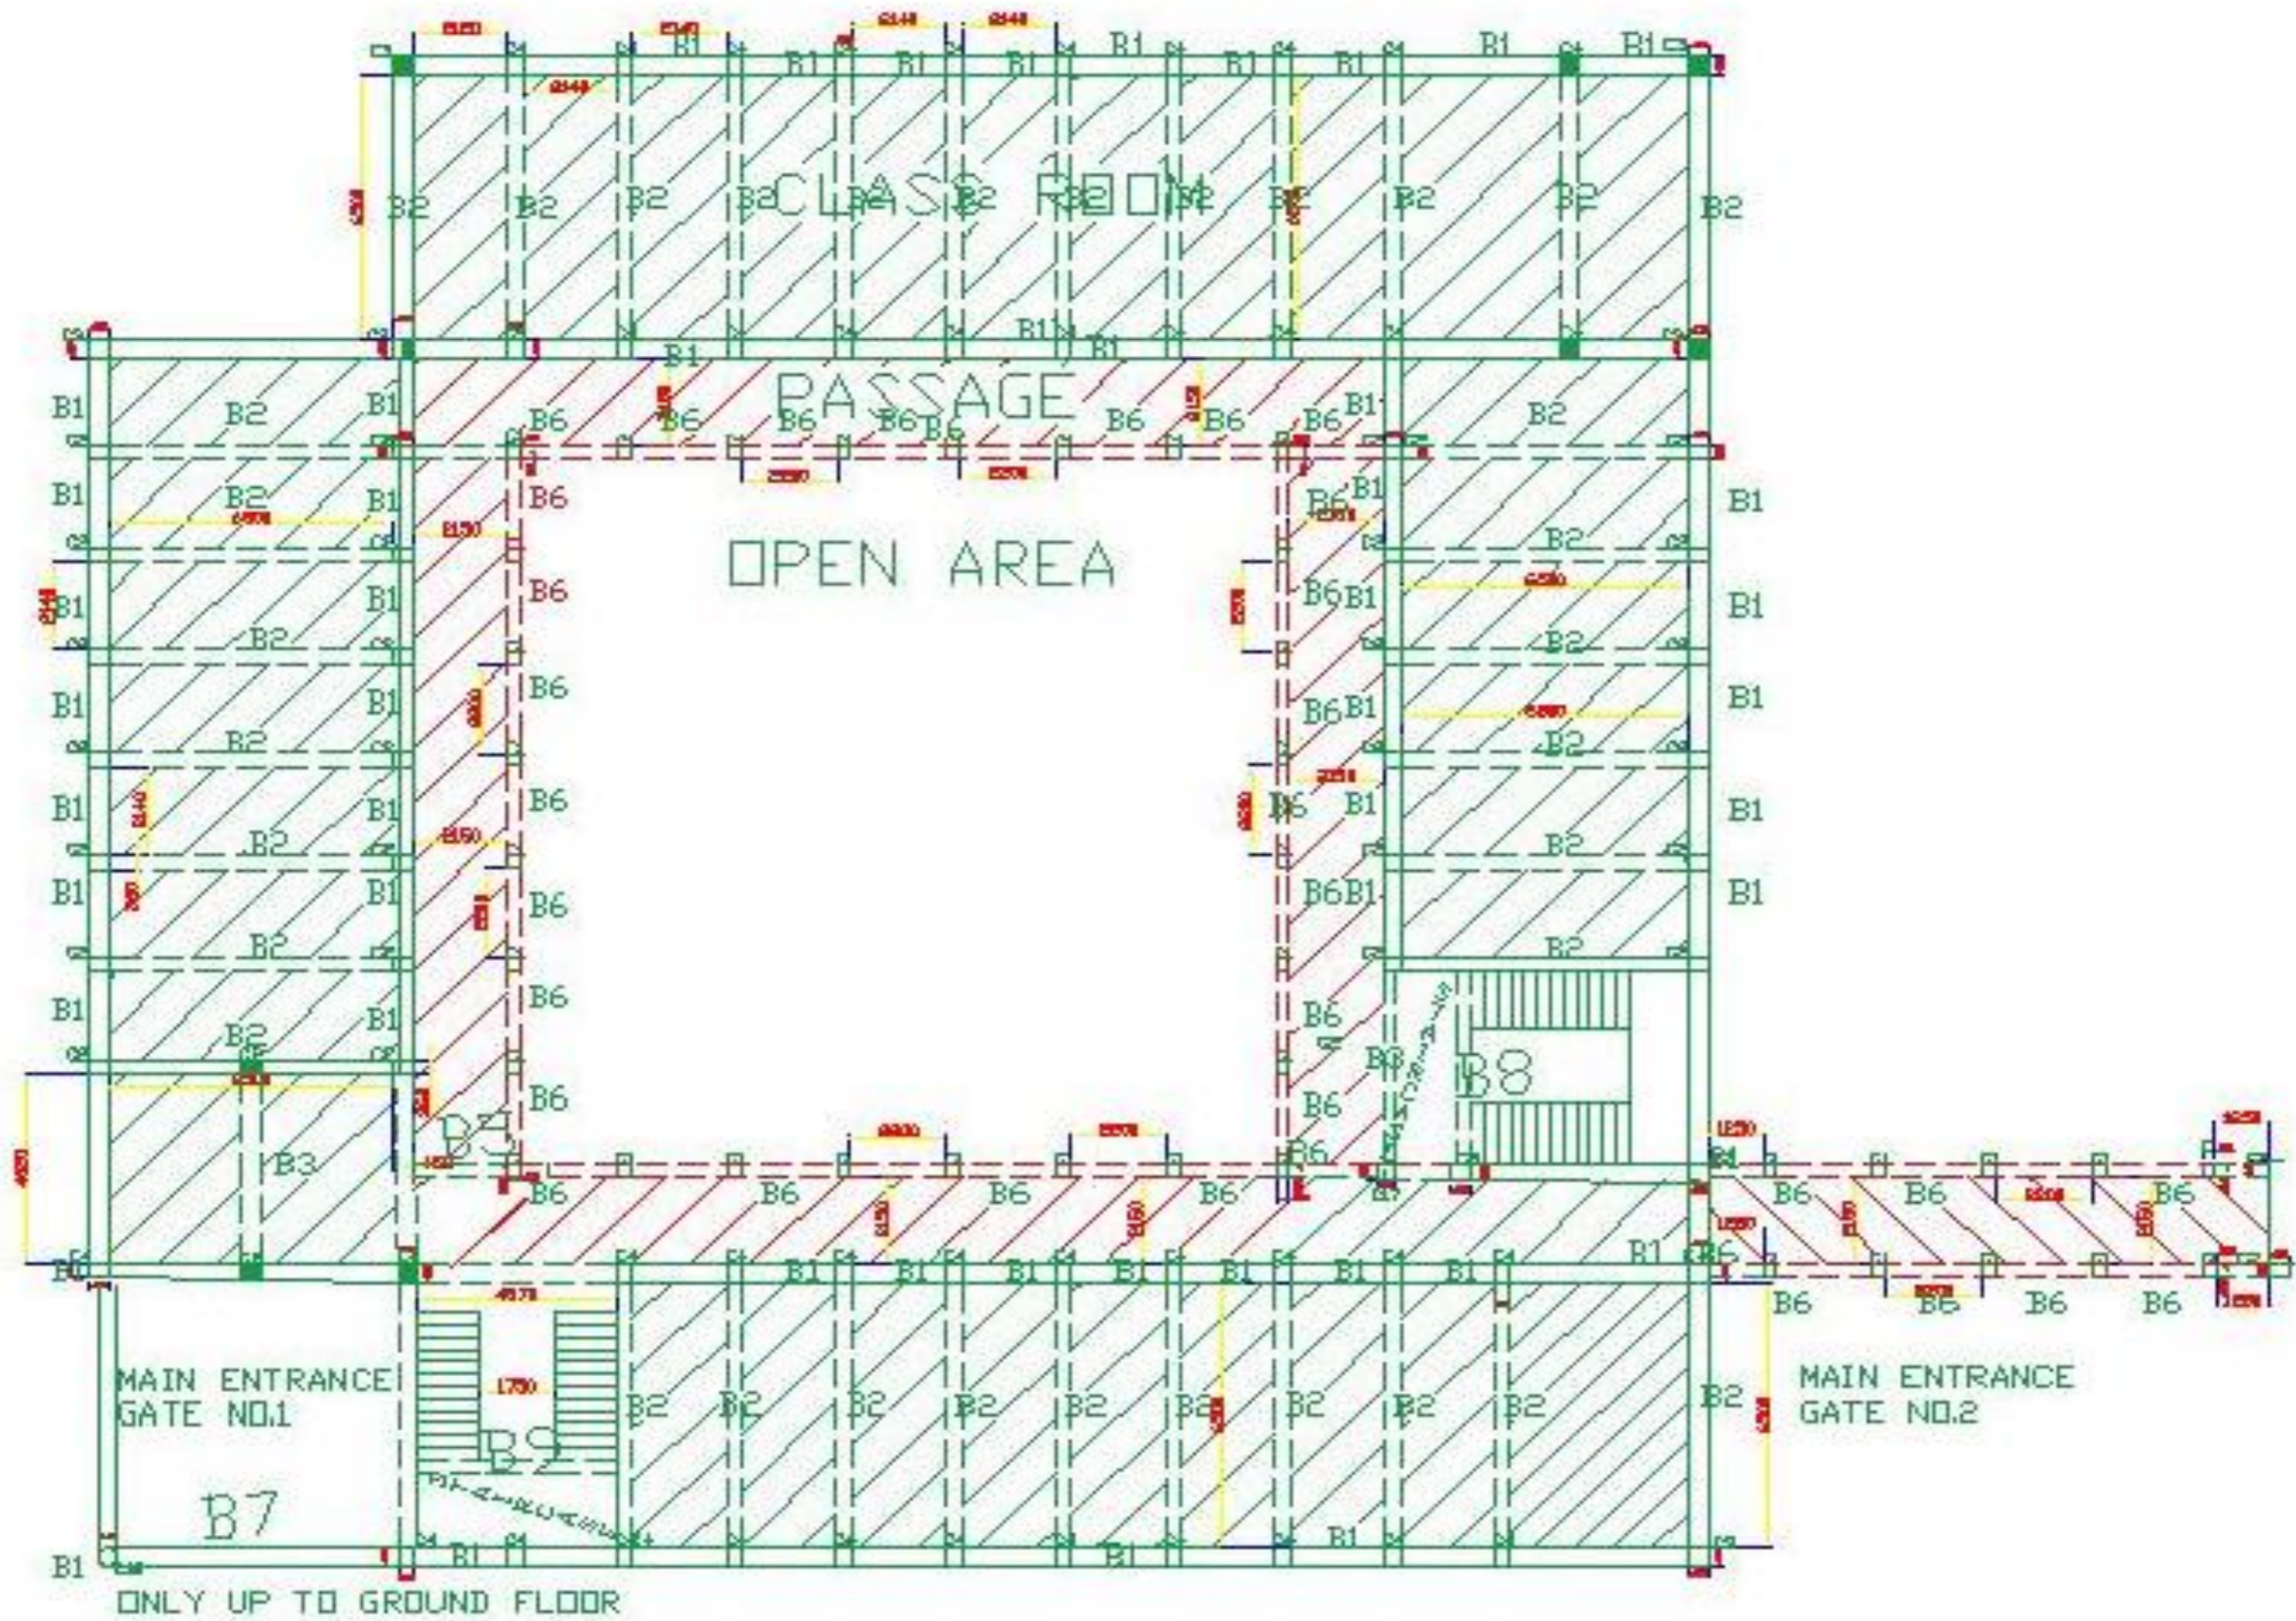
Structural Failure in RCC member of Block A (Marked in Red Colour)
